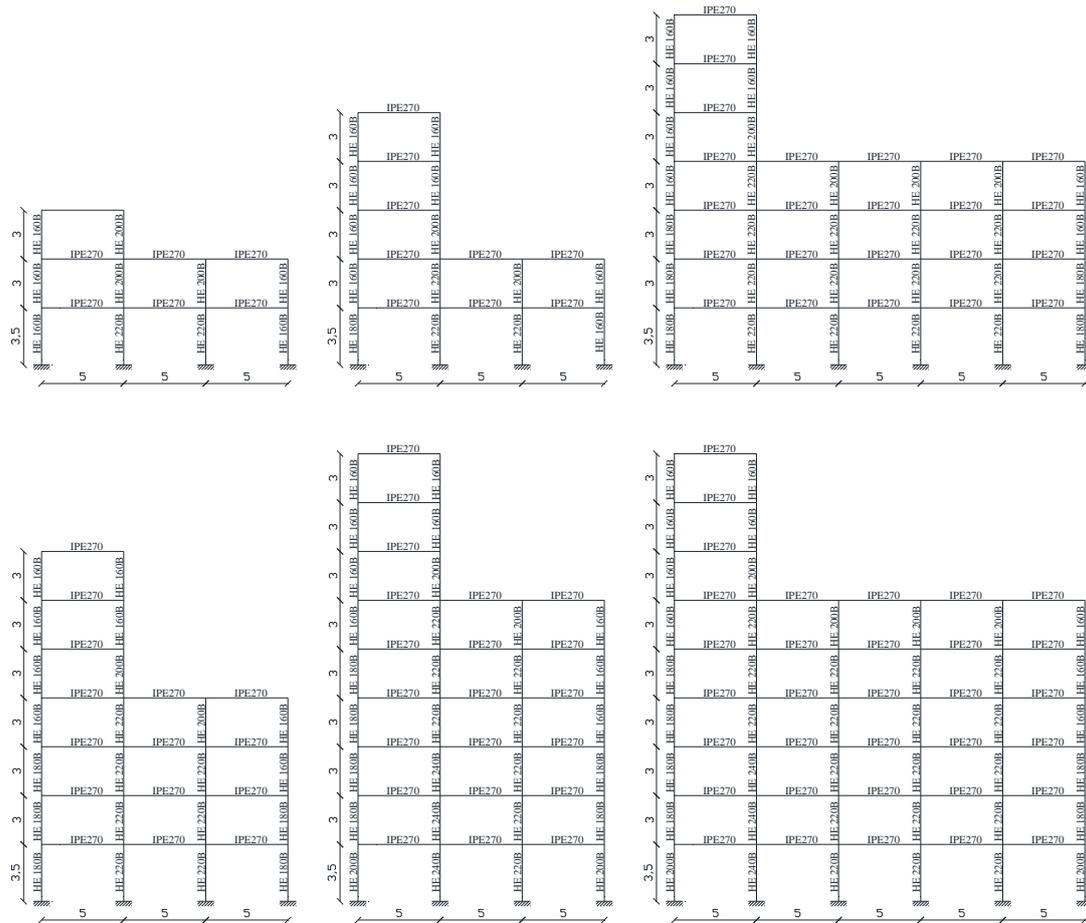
Study cases: irregular in elevation moment resisting frame structures.
